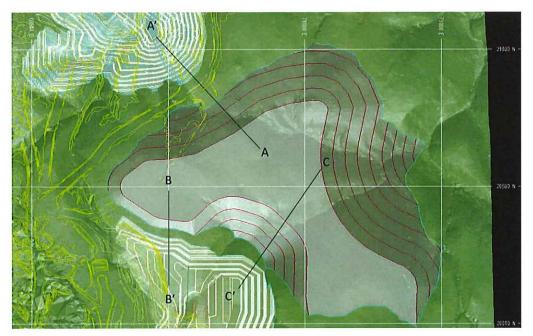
Plan location of the proposed Trimbles Waste Rock Stack, which lies between Coronation (south) and Coronation North (north) pits. Section lines are drawn.
